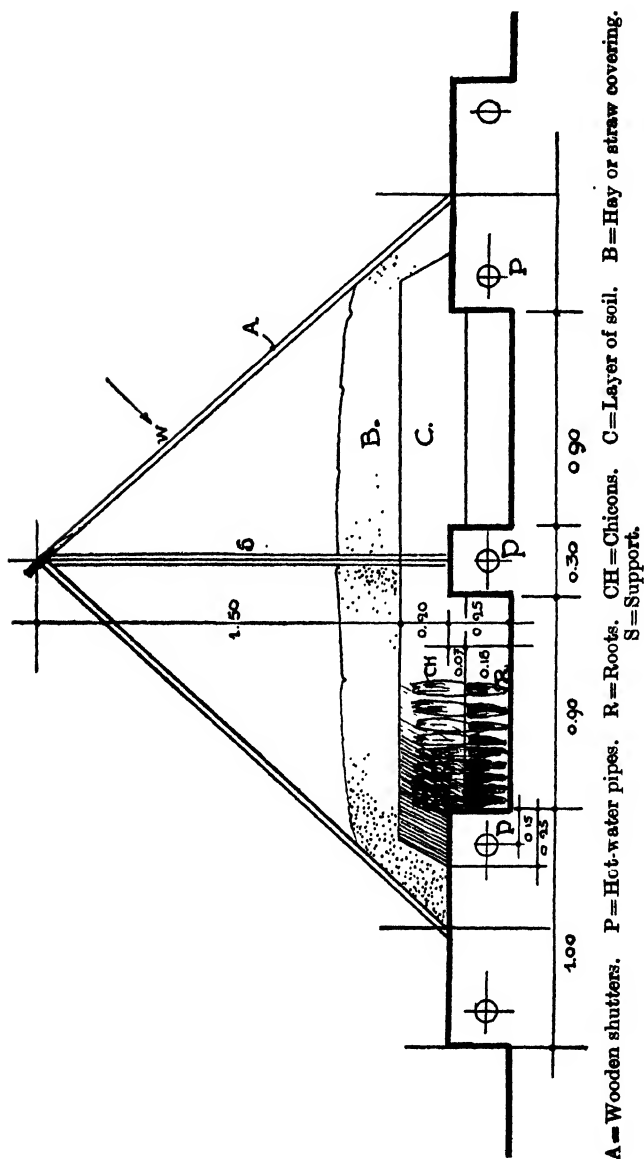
Section of Chicory beds showing arrangement of wooden shelters and pipes above the roots for forcing.
